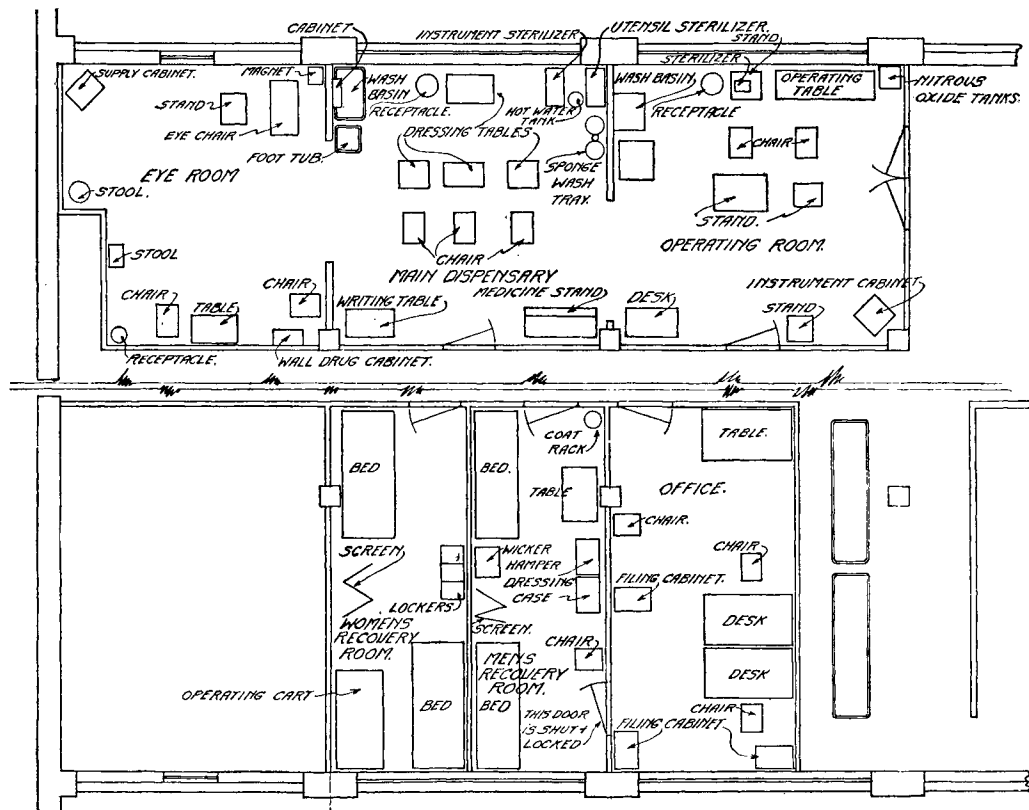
FLOOR PLAN OF FACTORY EMERGENCY HOSPITAL, SHOWING LOCATION OF EQUIPMENT.
